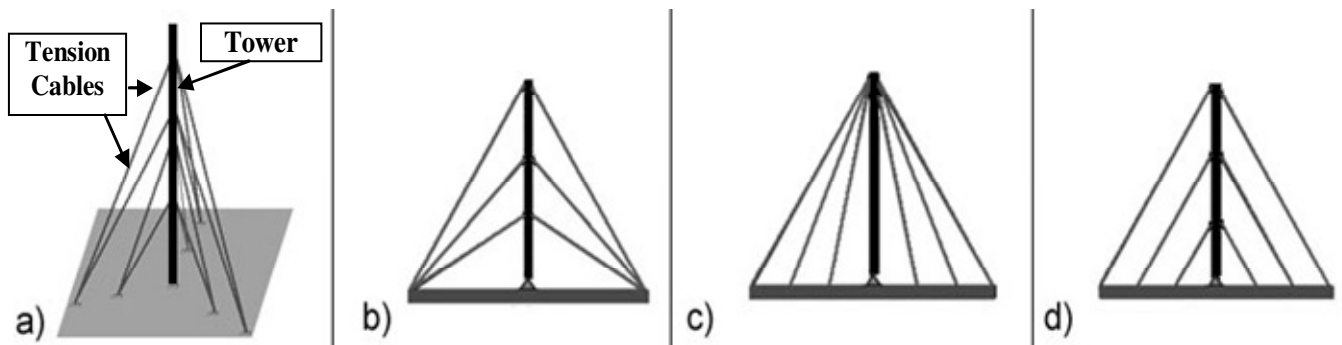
a) Cable-stayed Tower working principle, b) c) and d) - Main designs for cable-stayed towers
